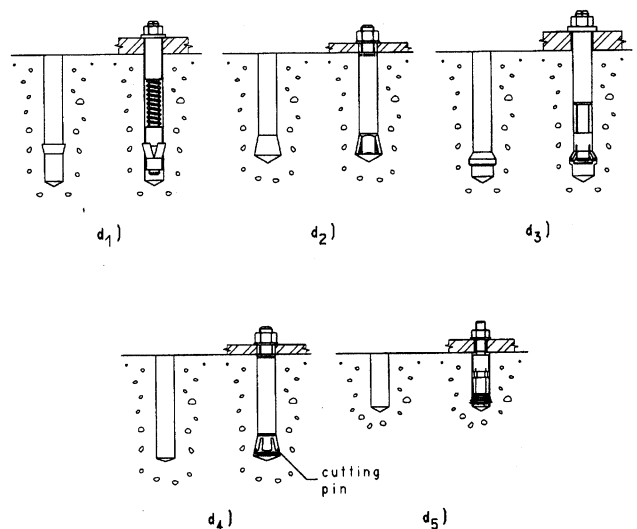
(d) — Fastening systems: undercut anchors (left-side sketches show hole shape; right-side sketches show installed anchors)
